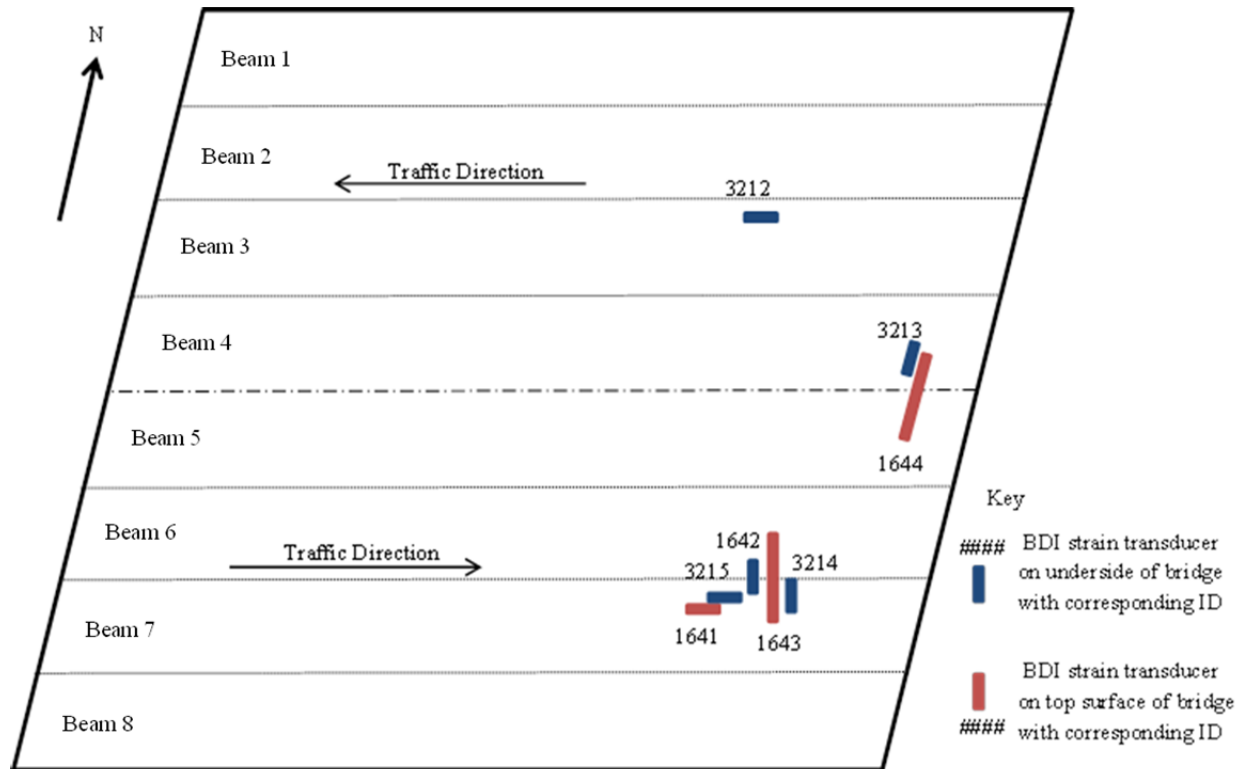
Strain Gauge Locations on the Knoxville, MD, Bridge
